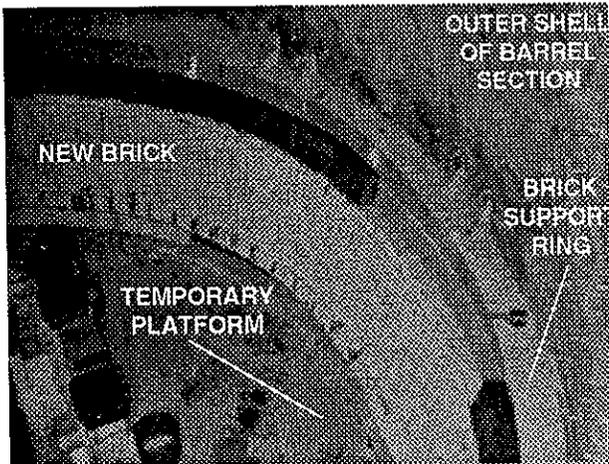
PHOTOGRAPH SHOWING NEW BRICK BEING INSTALLED IN THE BARREL SECTION.
